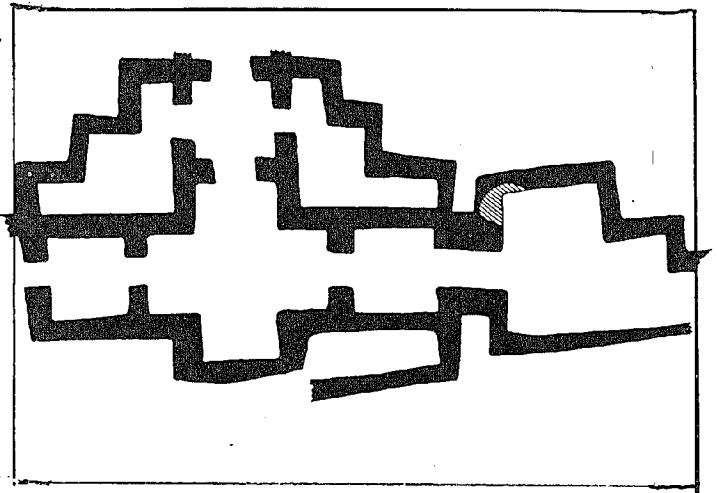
Plan of Building at Tell Songor B. (after Matsumoto 1981, Fig. 43).
